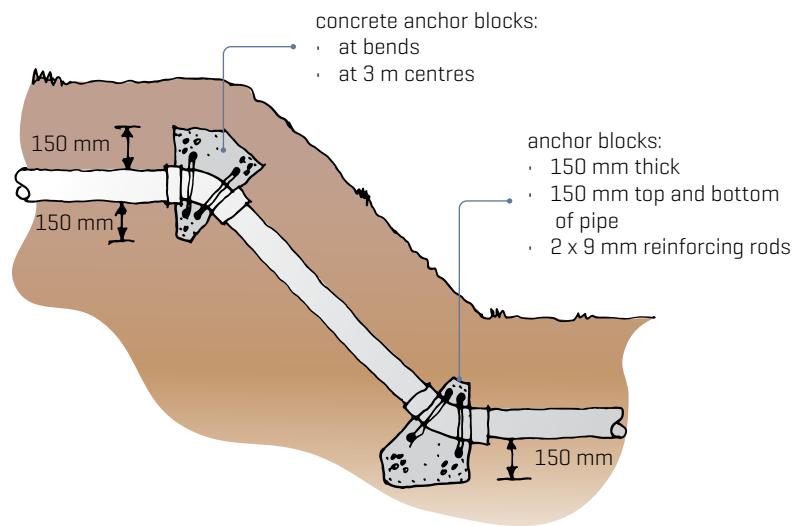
Drainage pipe on steep gradient [20° to vertical] – method of anchoring pipes up to 150 mm diameter.
